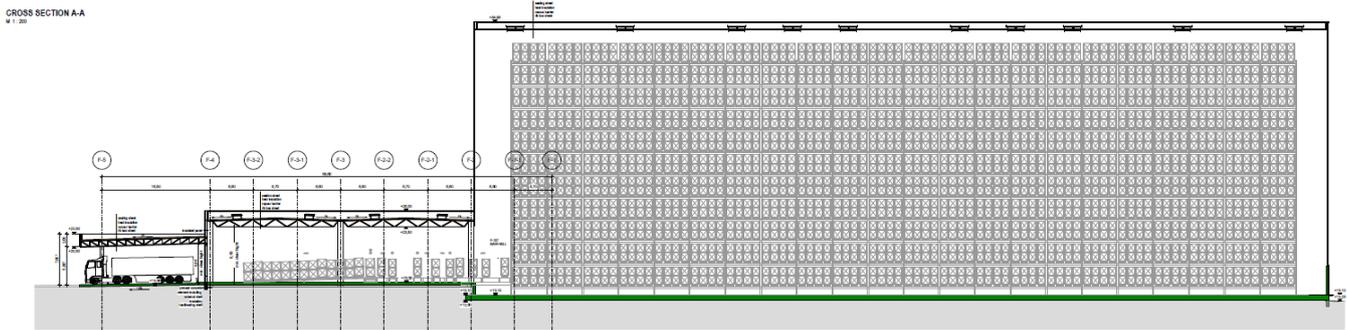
Cross-section of high bay warehouse and marshalling area ("F").
